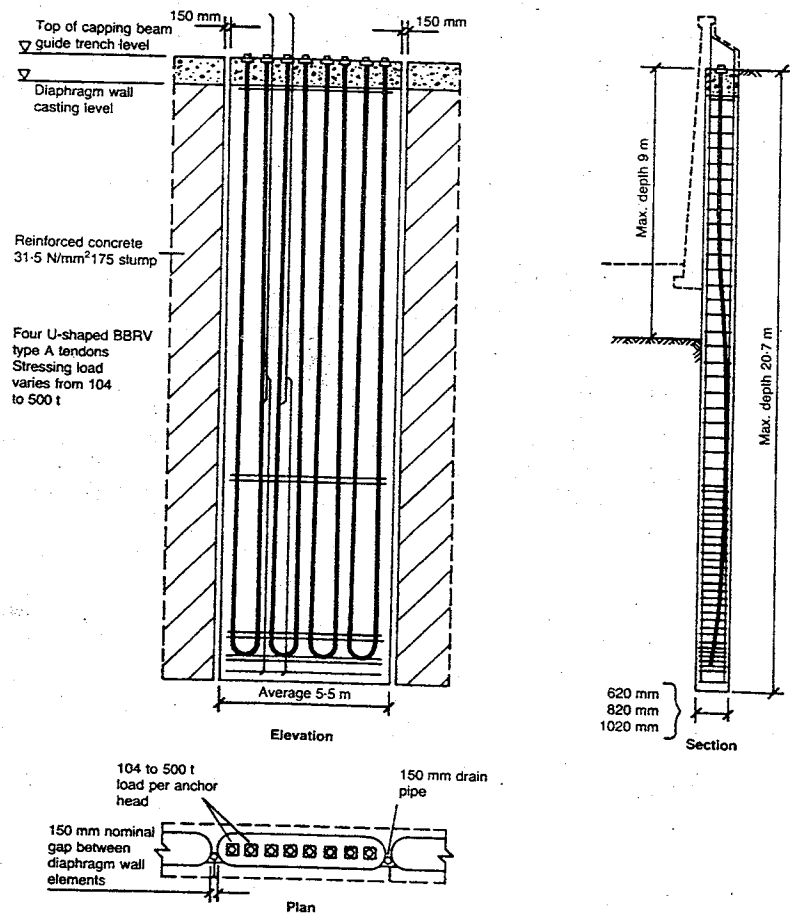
Typical diaphragm wall reinforcement cage with curved tendons, Irlam O' Heights near Manchester, UK (Fuchsberger and Gysi²¹)
